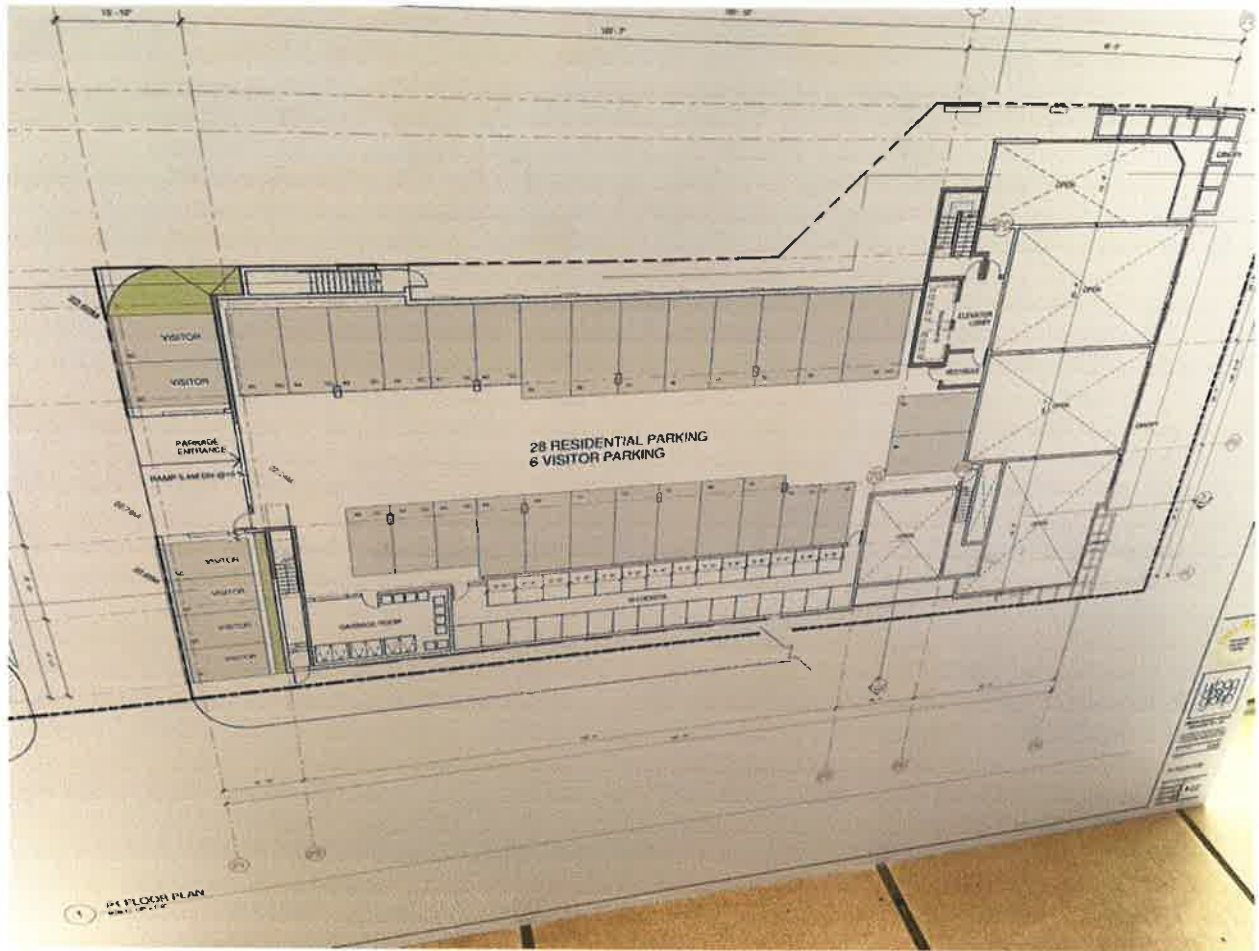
Chart showing the P1 Parking Plan with six outdoor VISITOR parking spaces.
